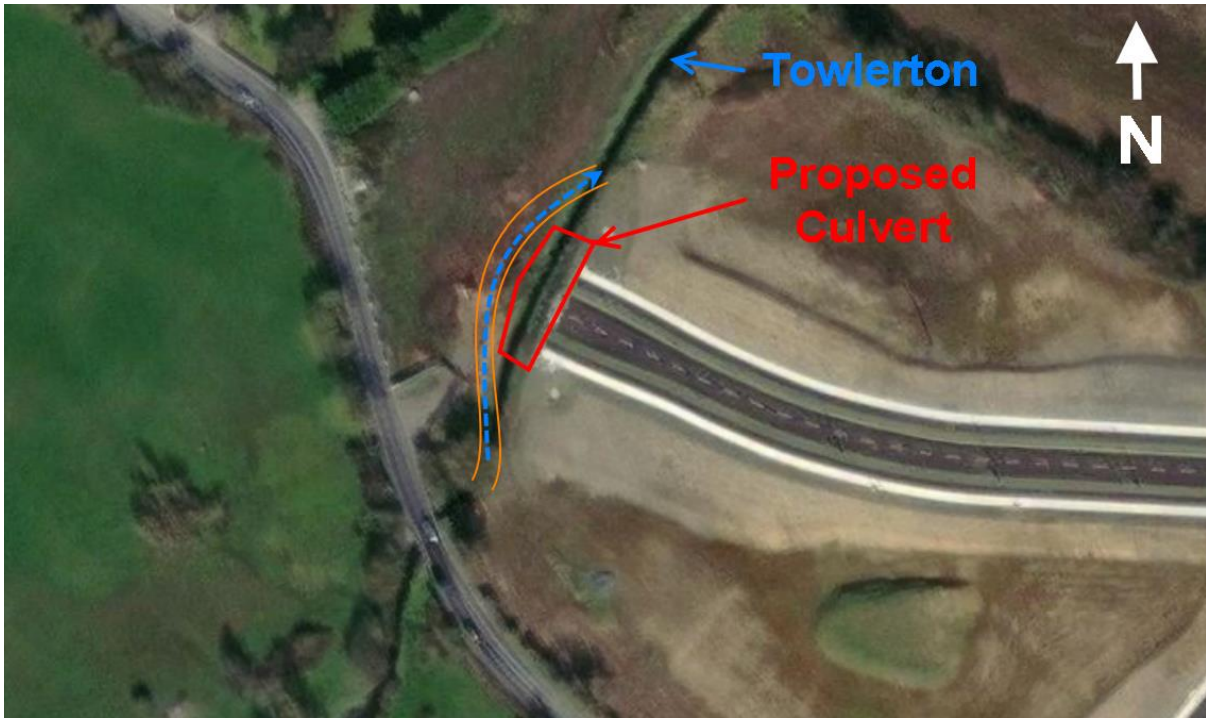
Proposed Temporary Stream Diversion for Culvert Construction
